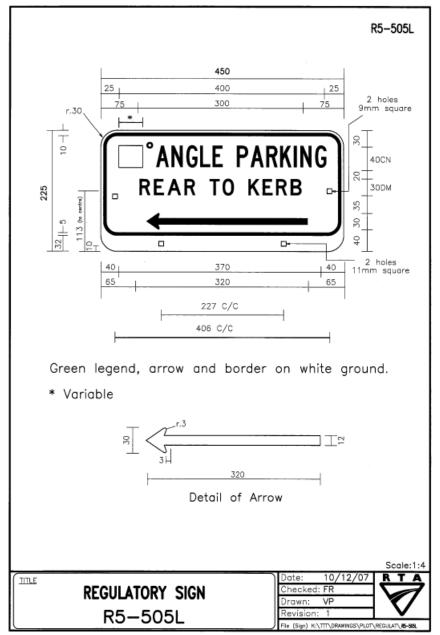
Signage to be installed approx. 15 meters from corner on Harris Street
